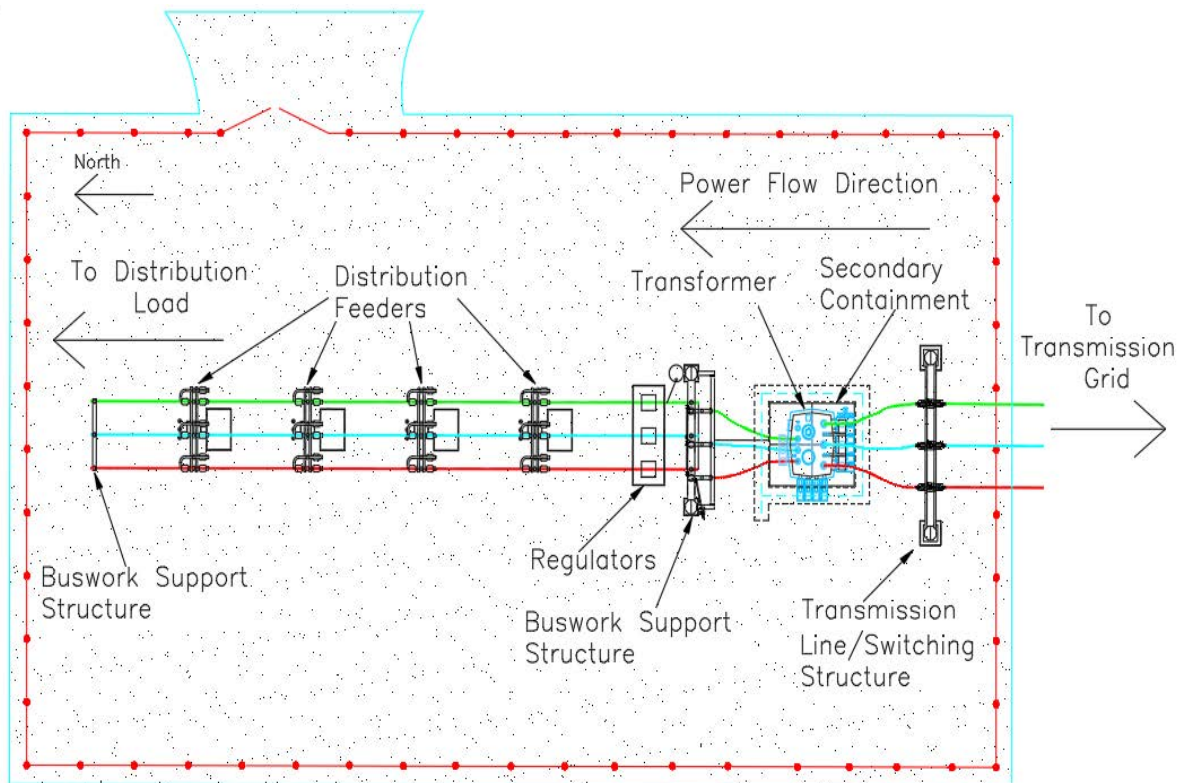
An example of a common layout for a substation similar to the proposed K-57 Substation
